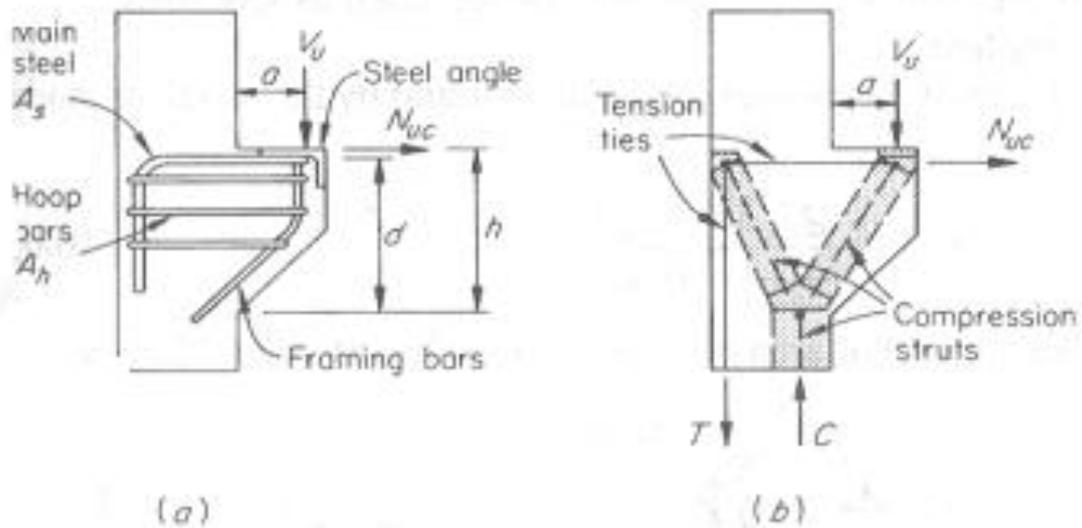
Typical reinforced concrete corbel(a) Loads and reinforcement (b)Strut-and-tie model for internal forces
